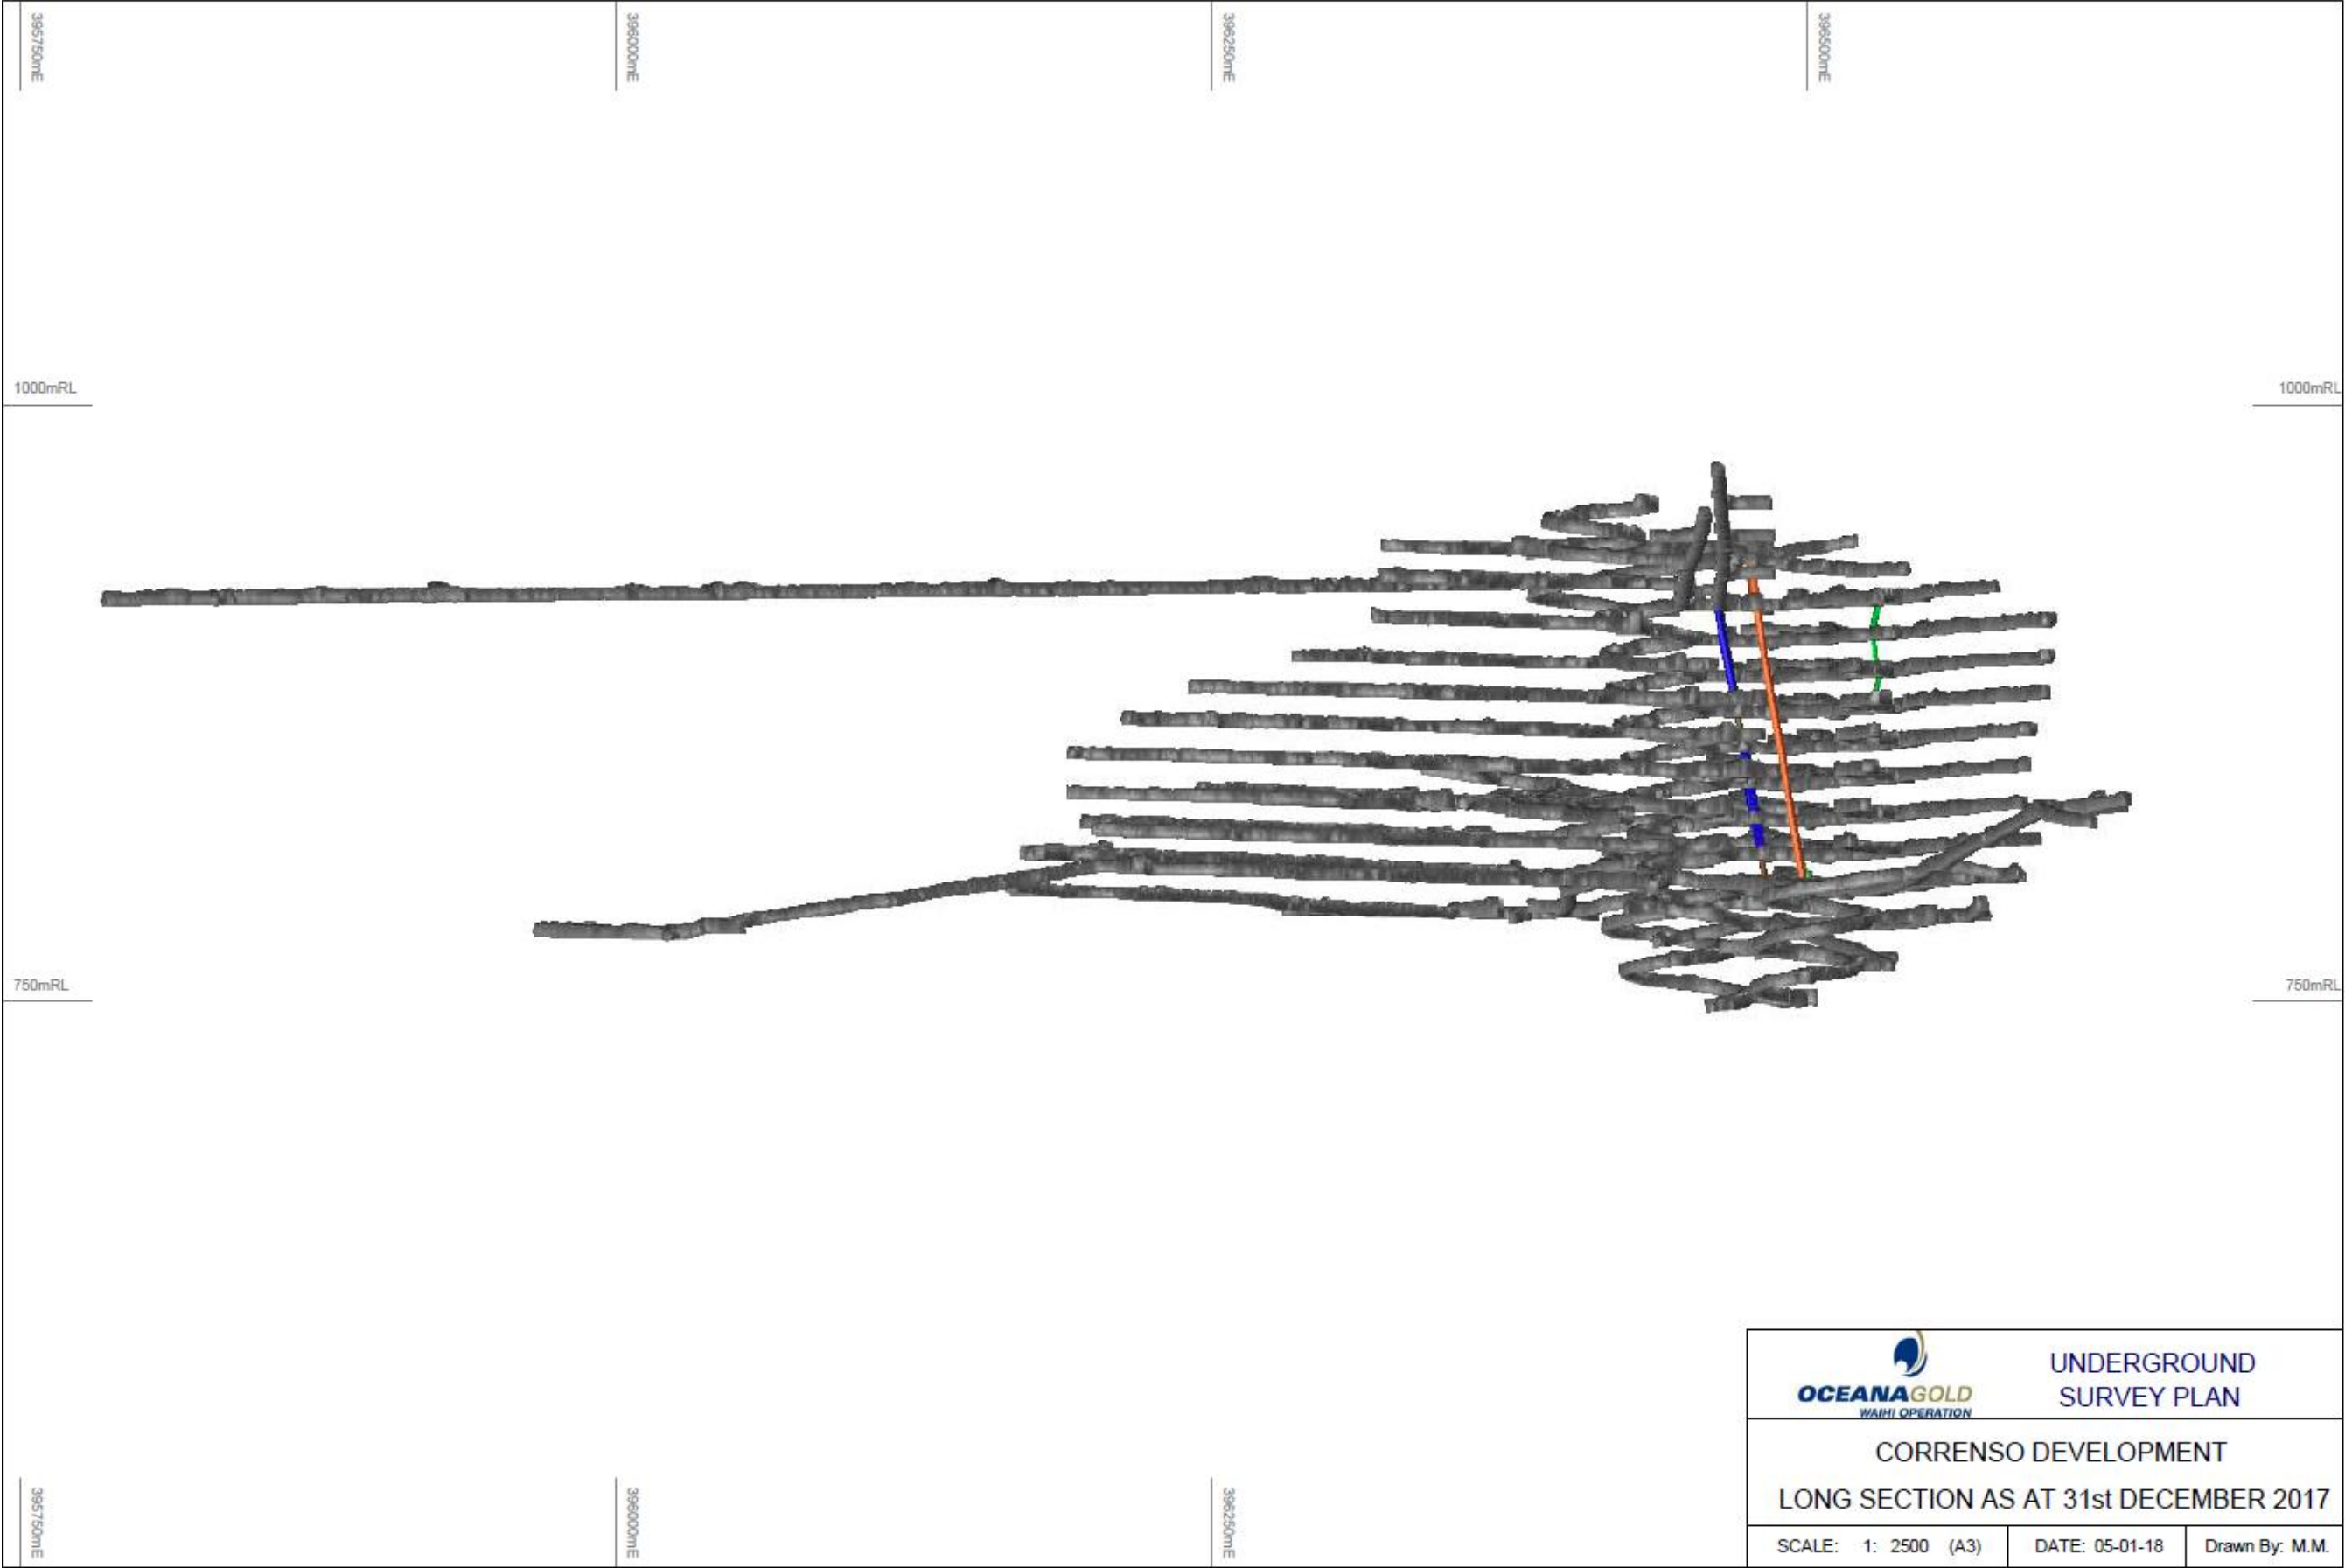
Correnso Development – Long Section View (left to right: east to west)
